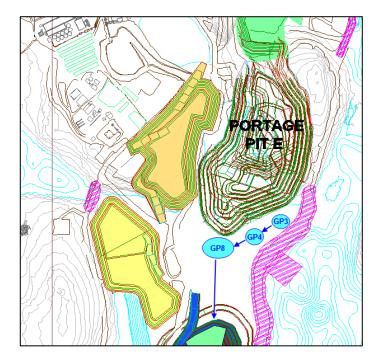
View of Portage Pit E area with the associated sumps and trenches
